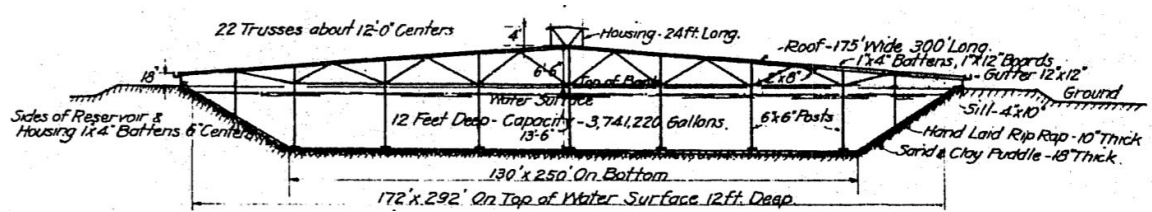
Belmont Reservoir Cross Section (SVWC drawing)
